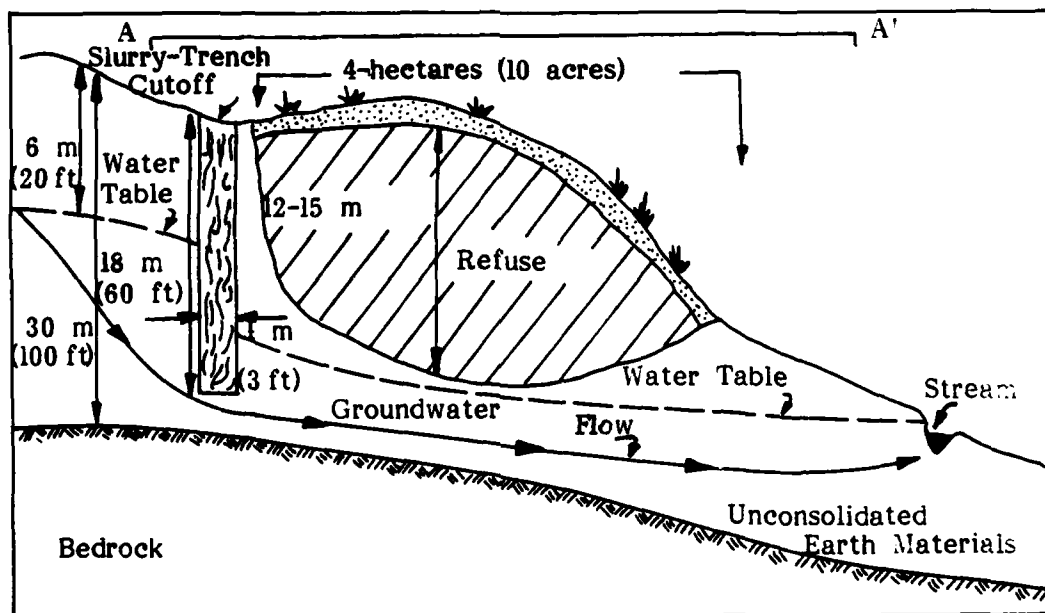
Cross Section of Landfill After Slurry-Trench Cutoff Wall Installation (Tolman et al., 1978)
